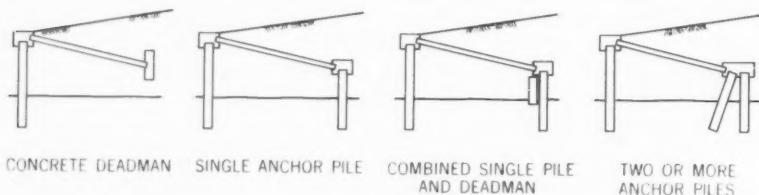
Type of anchorage used for retaining walls depends on height of fill and type of material retained.
